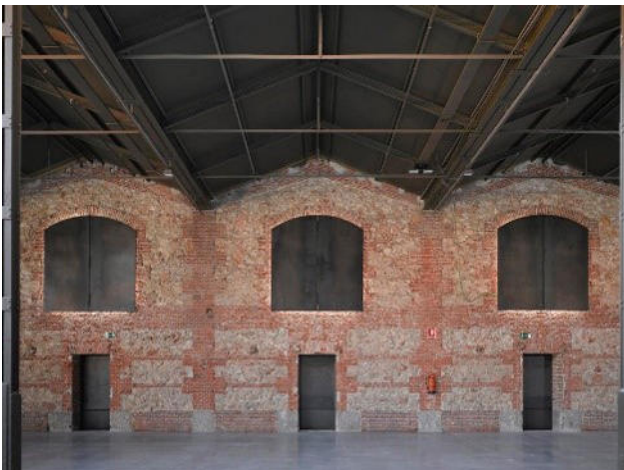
Inside view of the refurbished masonry structure in warehouse 16.
